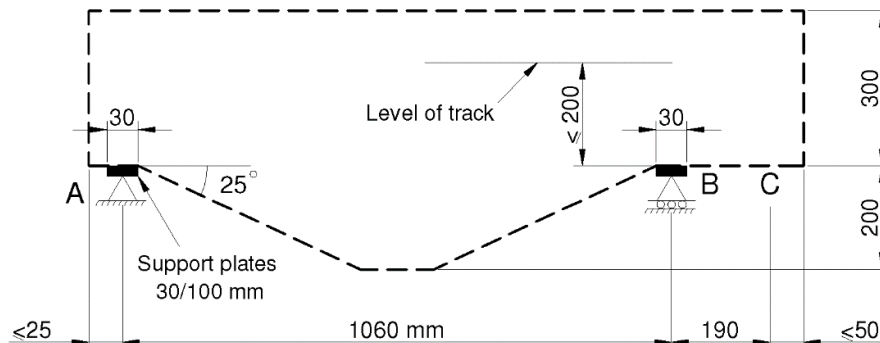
Dimensional constraints outlining the maximum allowed dimensions of the bridge in elevation
